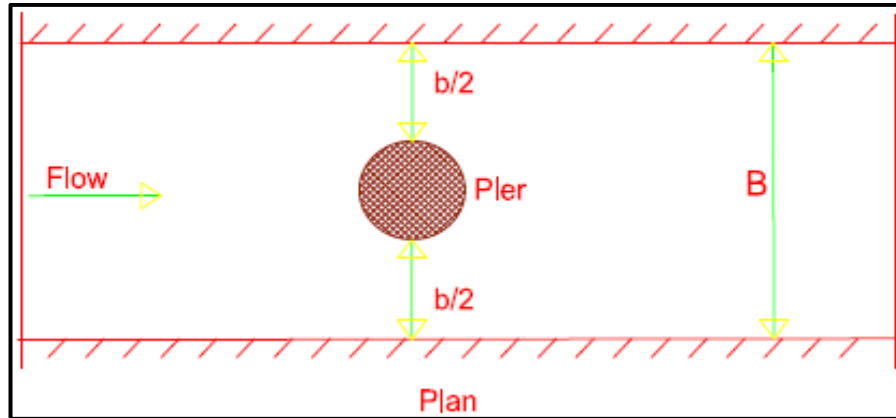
Plan view of the pier (Ipa and Di 2017)
